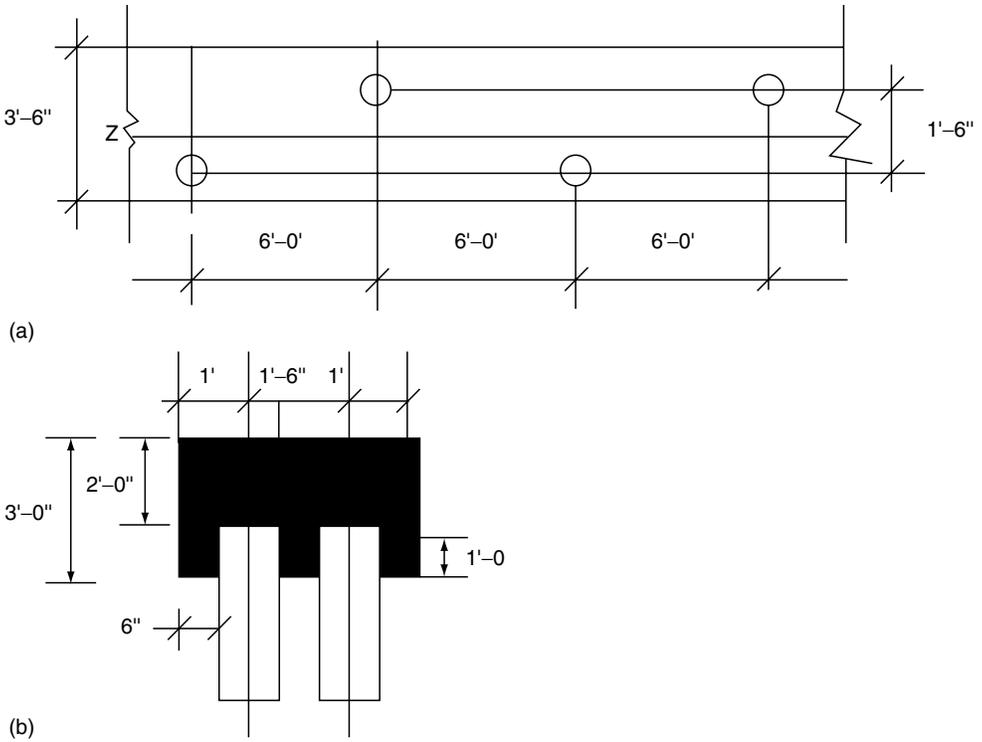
Illustration for Example 5.7: (a) front elevation; (b) side elevation.
